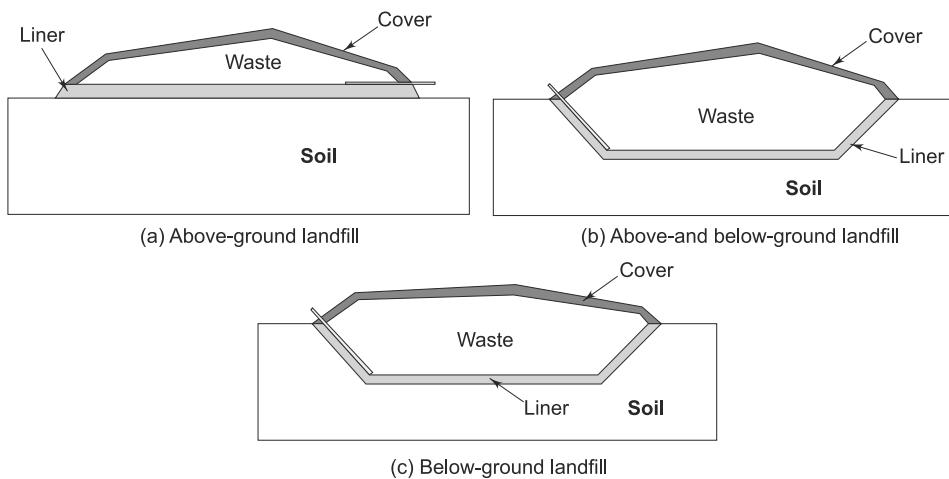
Cross-section of Landfills for Solid Waste Disposal
